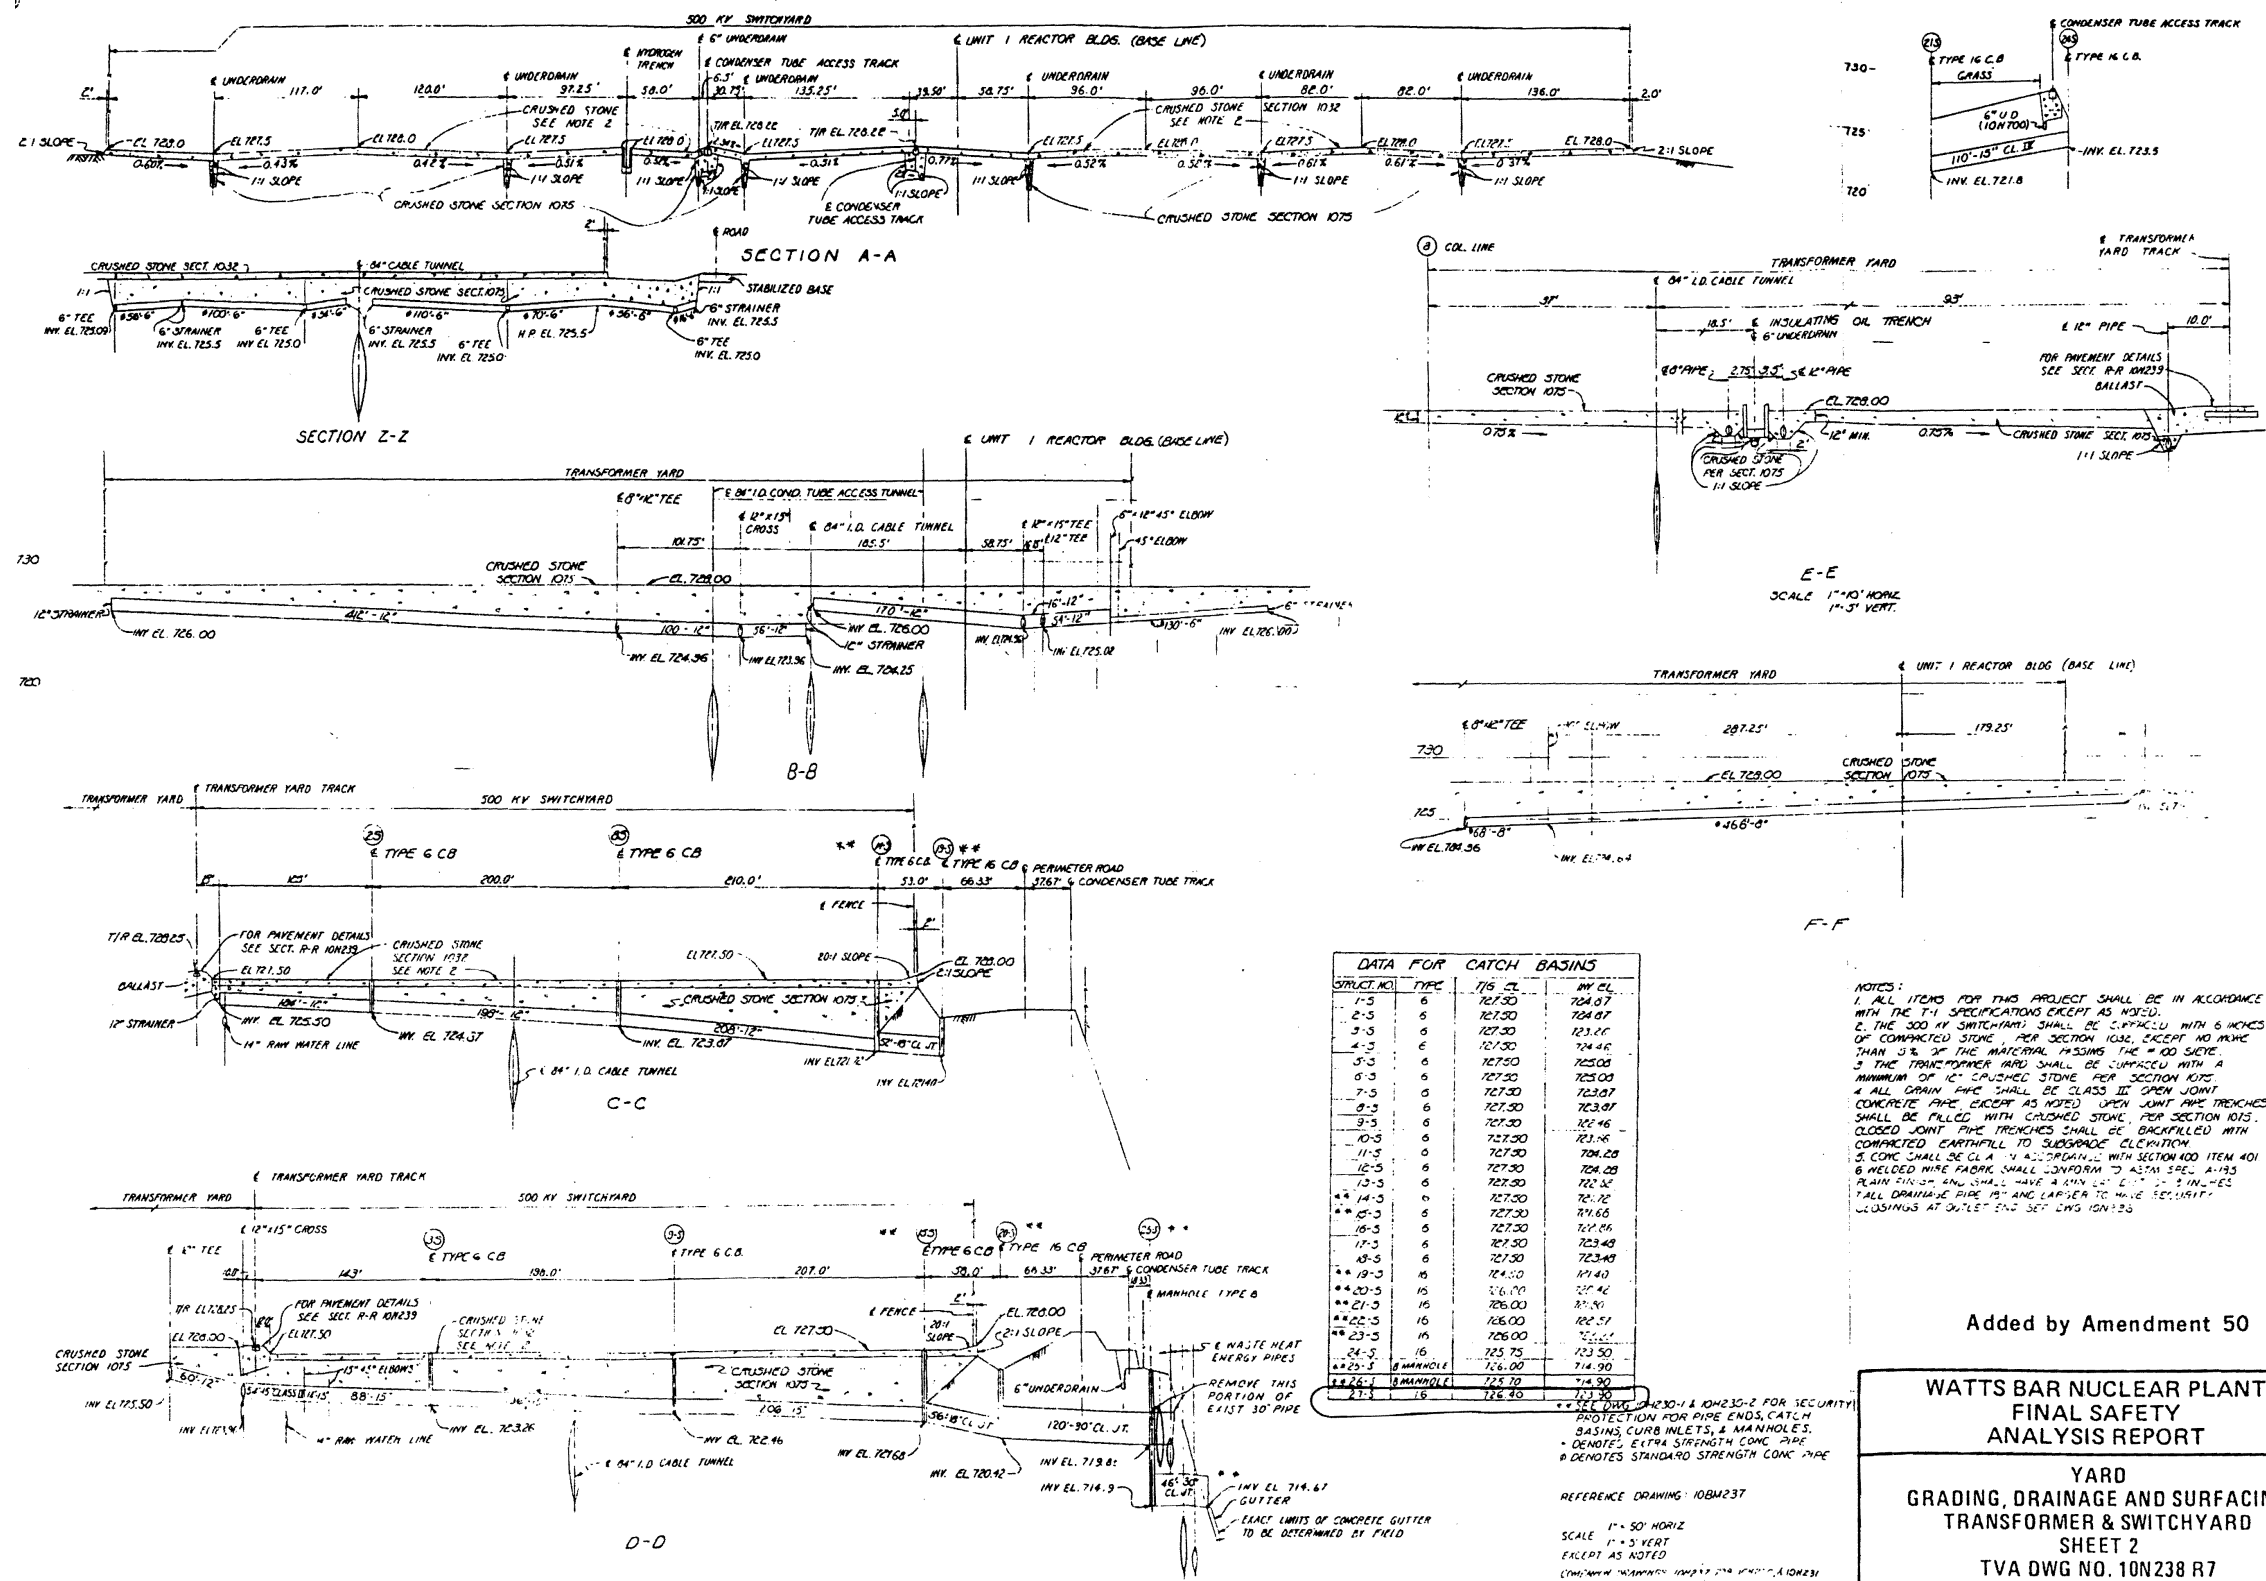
Yard, Grading Drainage and Surfacing Transformer & Switchyard - Sheet 2
